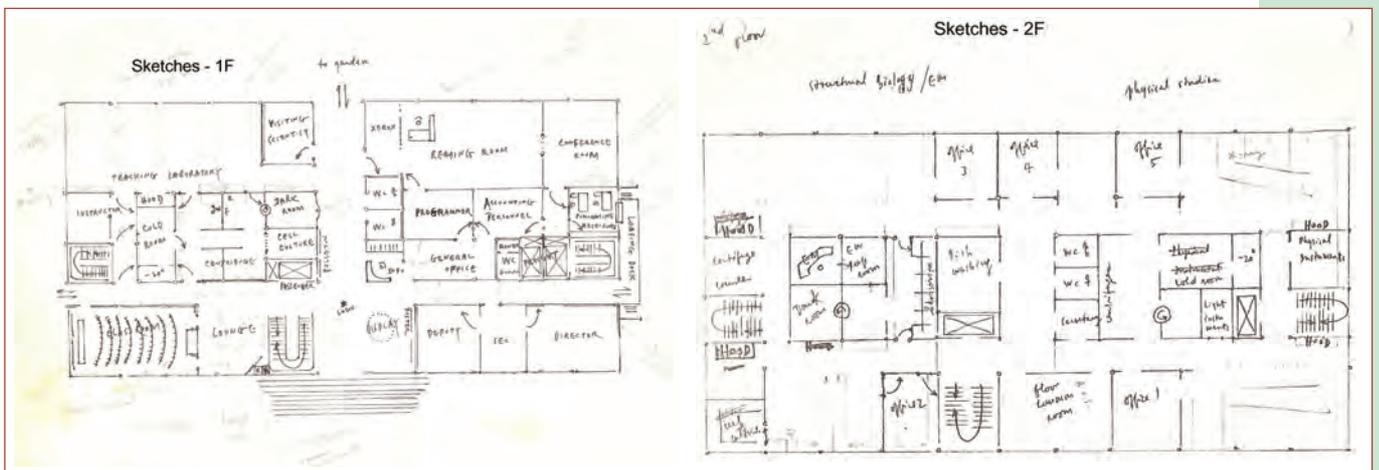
/4 Sketches of floor design, featuring lab-without a wall concept.
